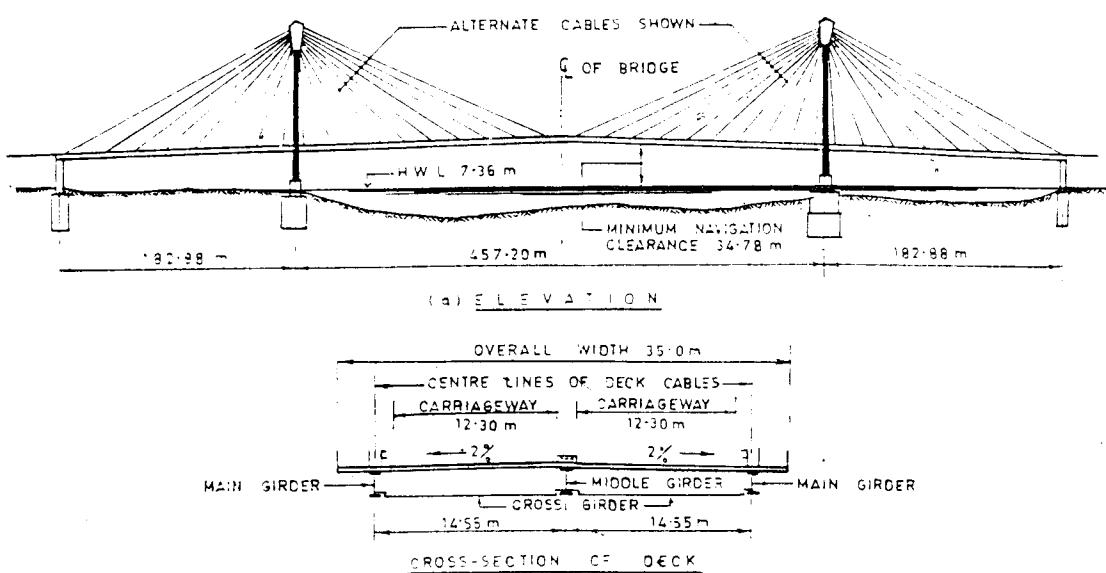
SECOND HOOGHLY BRIDGE AT CALCUTTA (Under construction)
